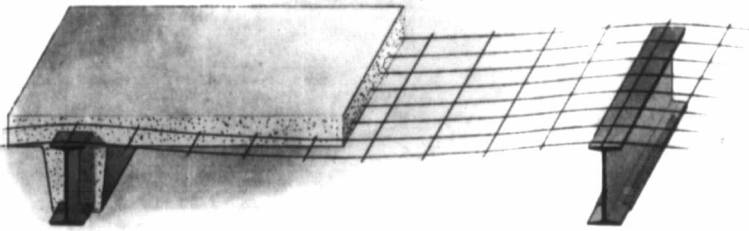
is the same as No. 1, excepting that the reinforcing is placed near the top of floor over the I beams, and deflected to near the bottom of the floor slab in the centre, between the bearings.
